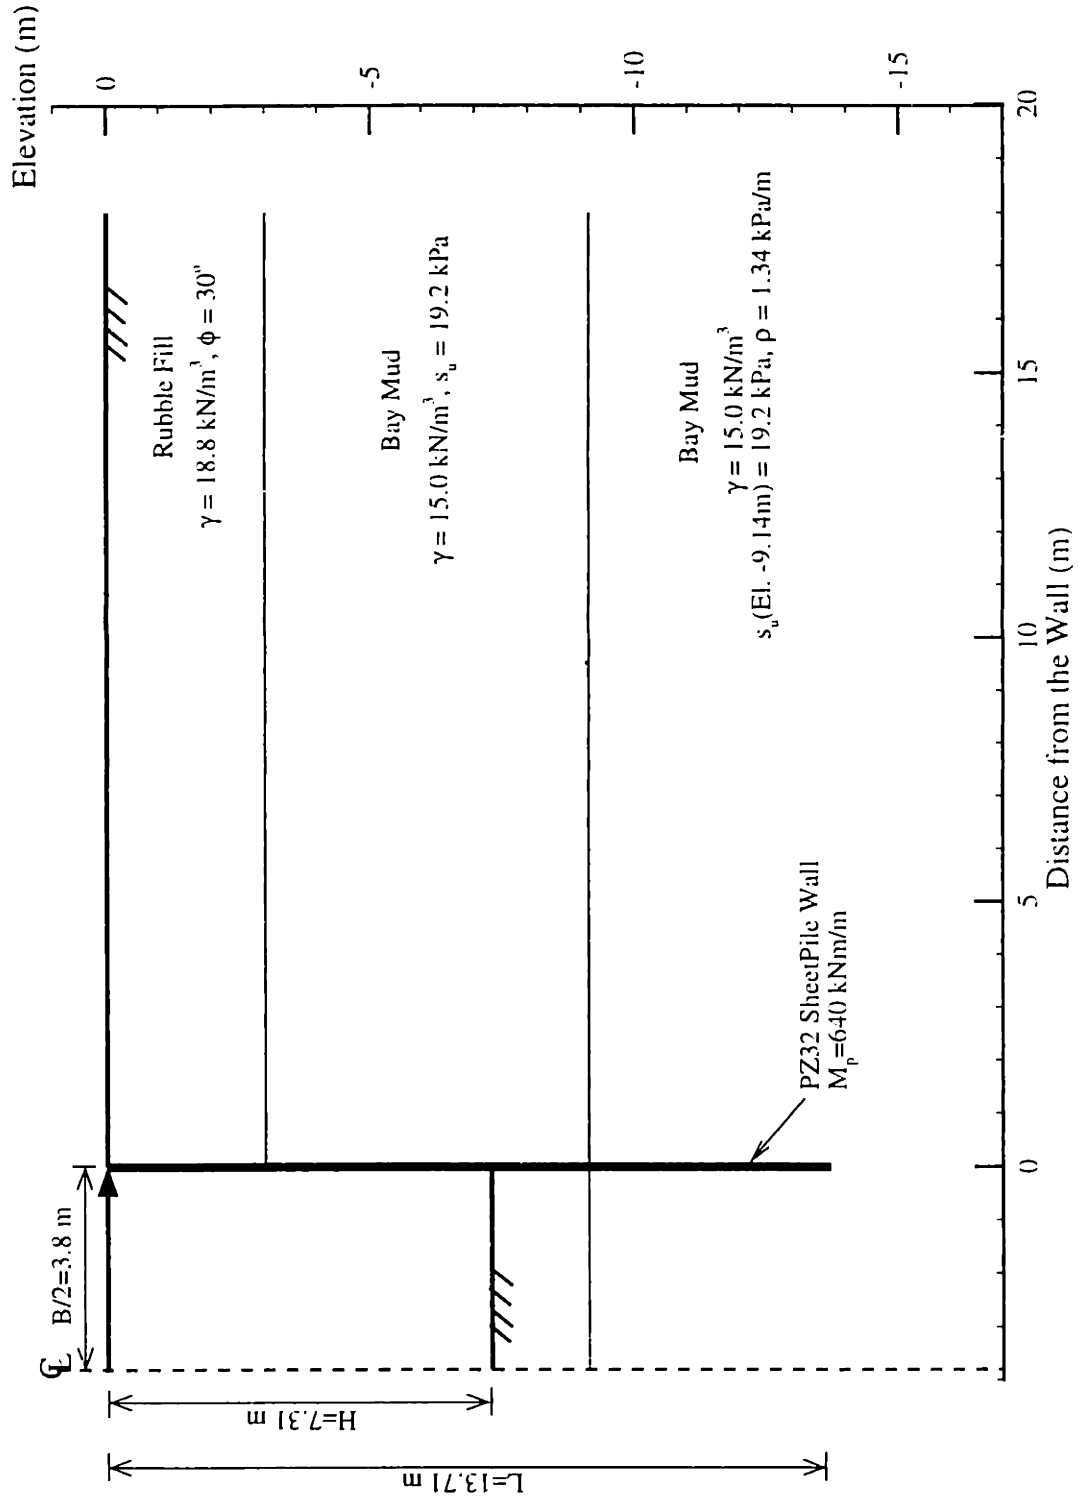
A.8 Excavation Geometry at Davidson Avenue #2 (Clough & Reed, 1984)
